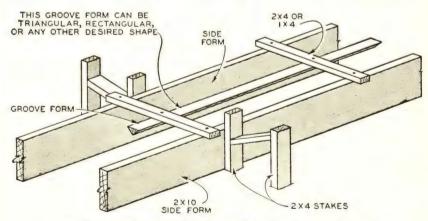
Footing Formwork with Form for Anchor Groove in Place
